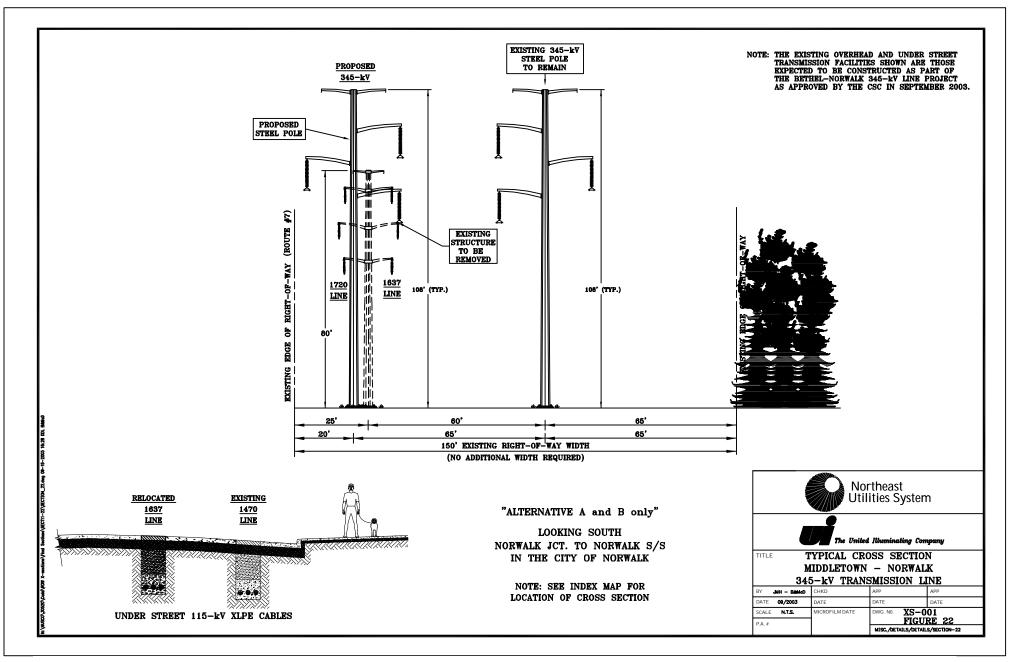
Cross section 22 - Norwalk Junction to Norwalk Substation (Norwalk)
